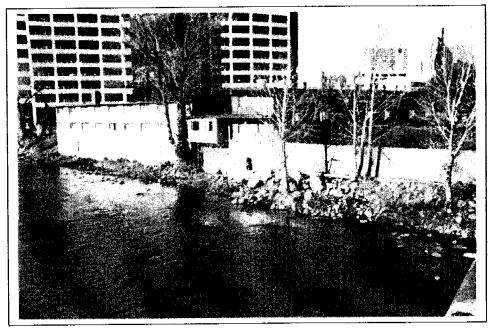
Section M, north bank, west of Virginia Street, camera facing north, 10/24/01.
